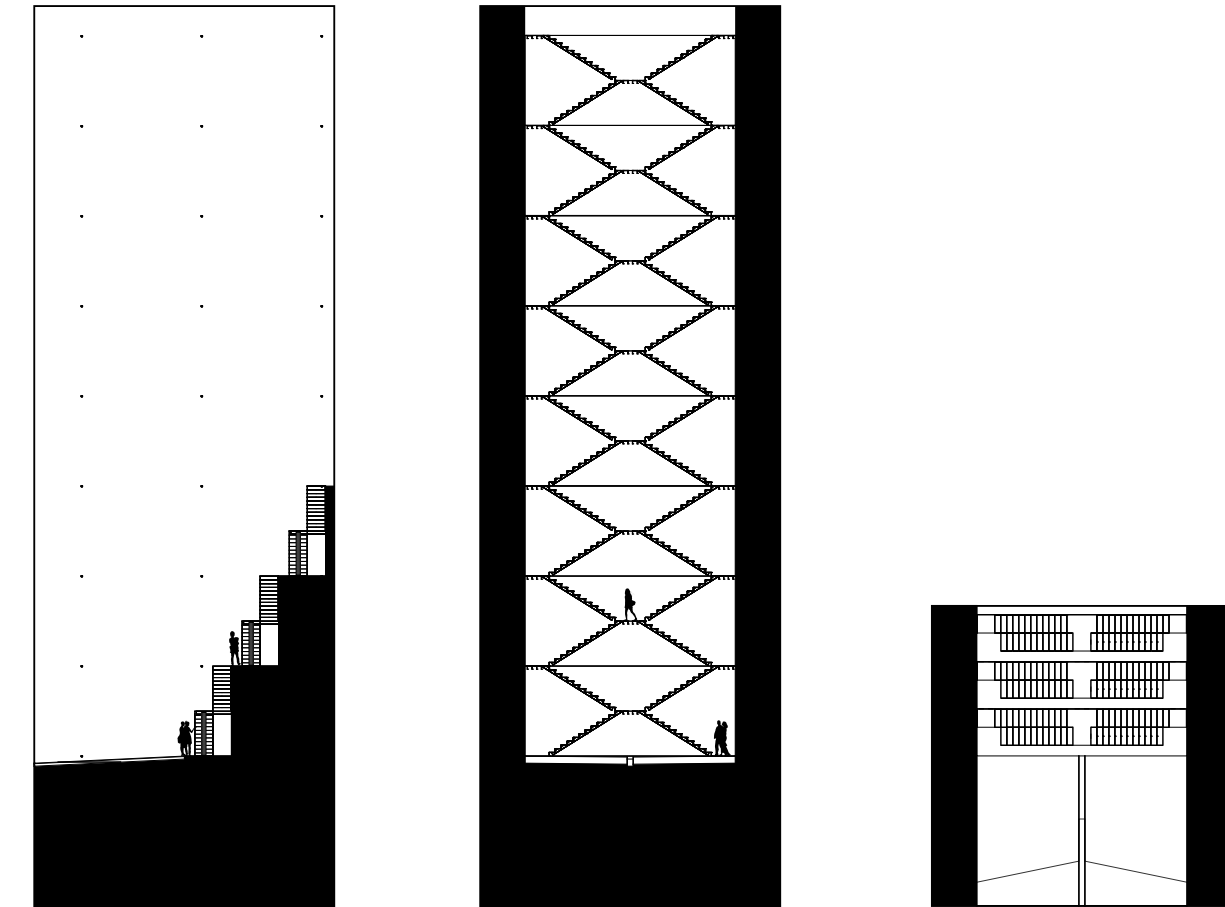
Details of stairs within the hall of basalts. The quarry benches are used to define the geometry of the stairs. Detailing of the stairs
